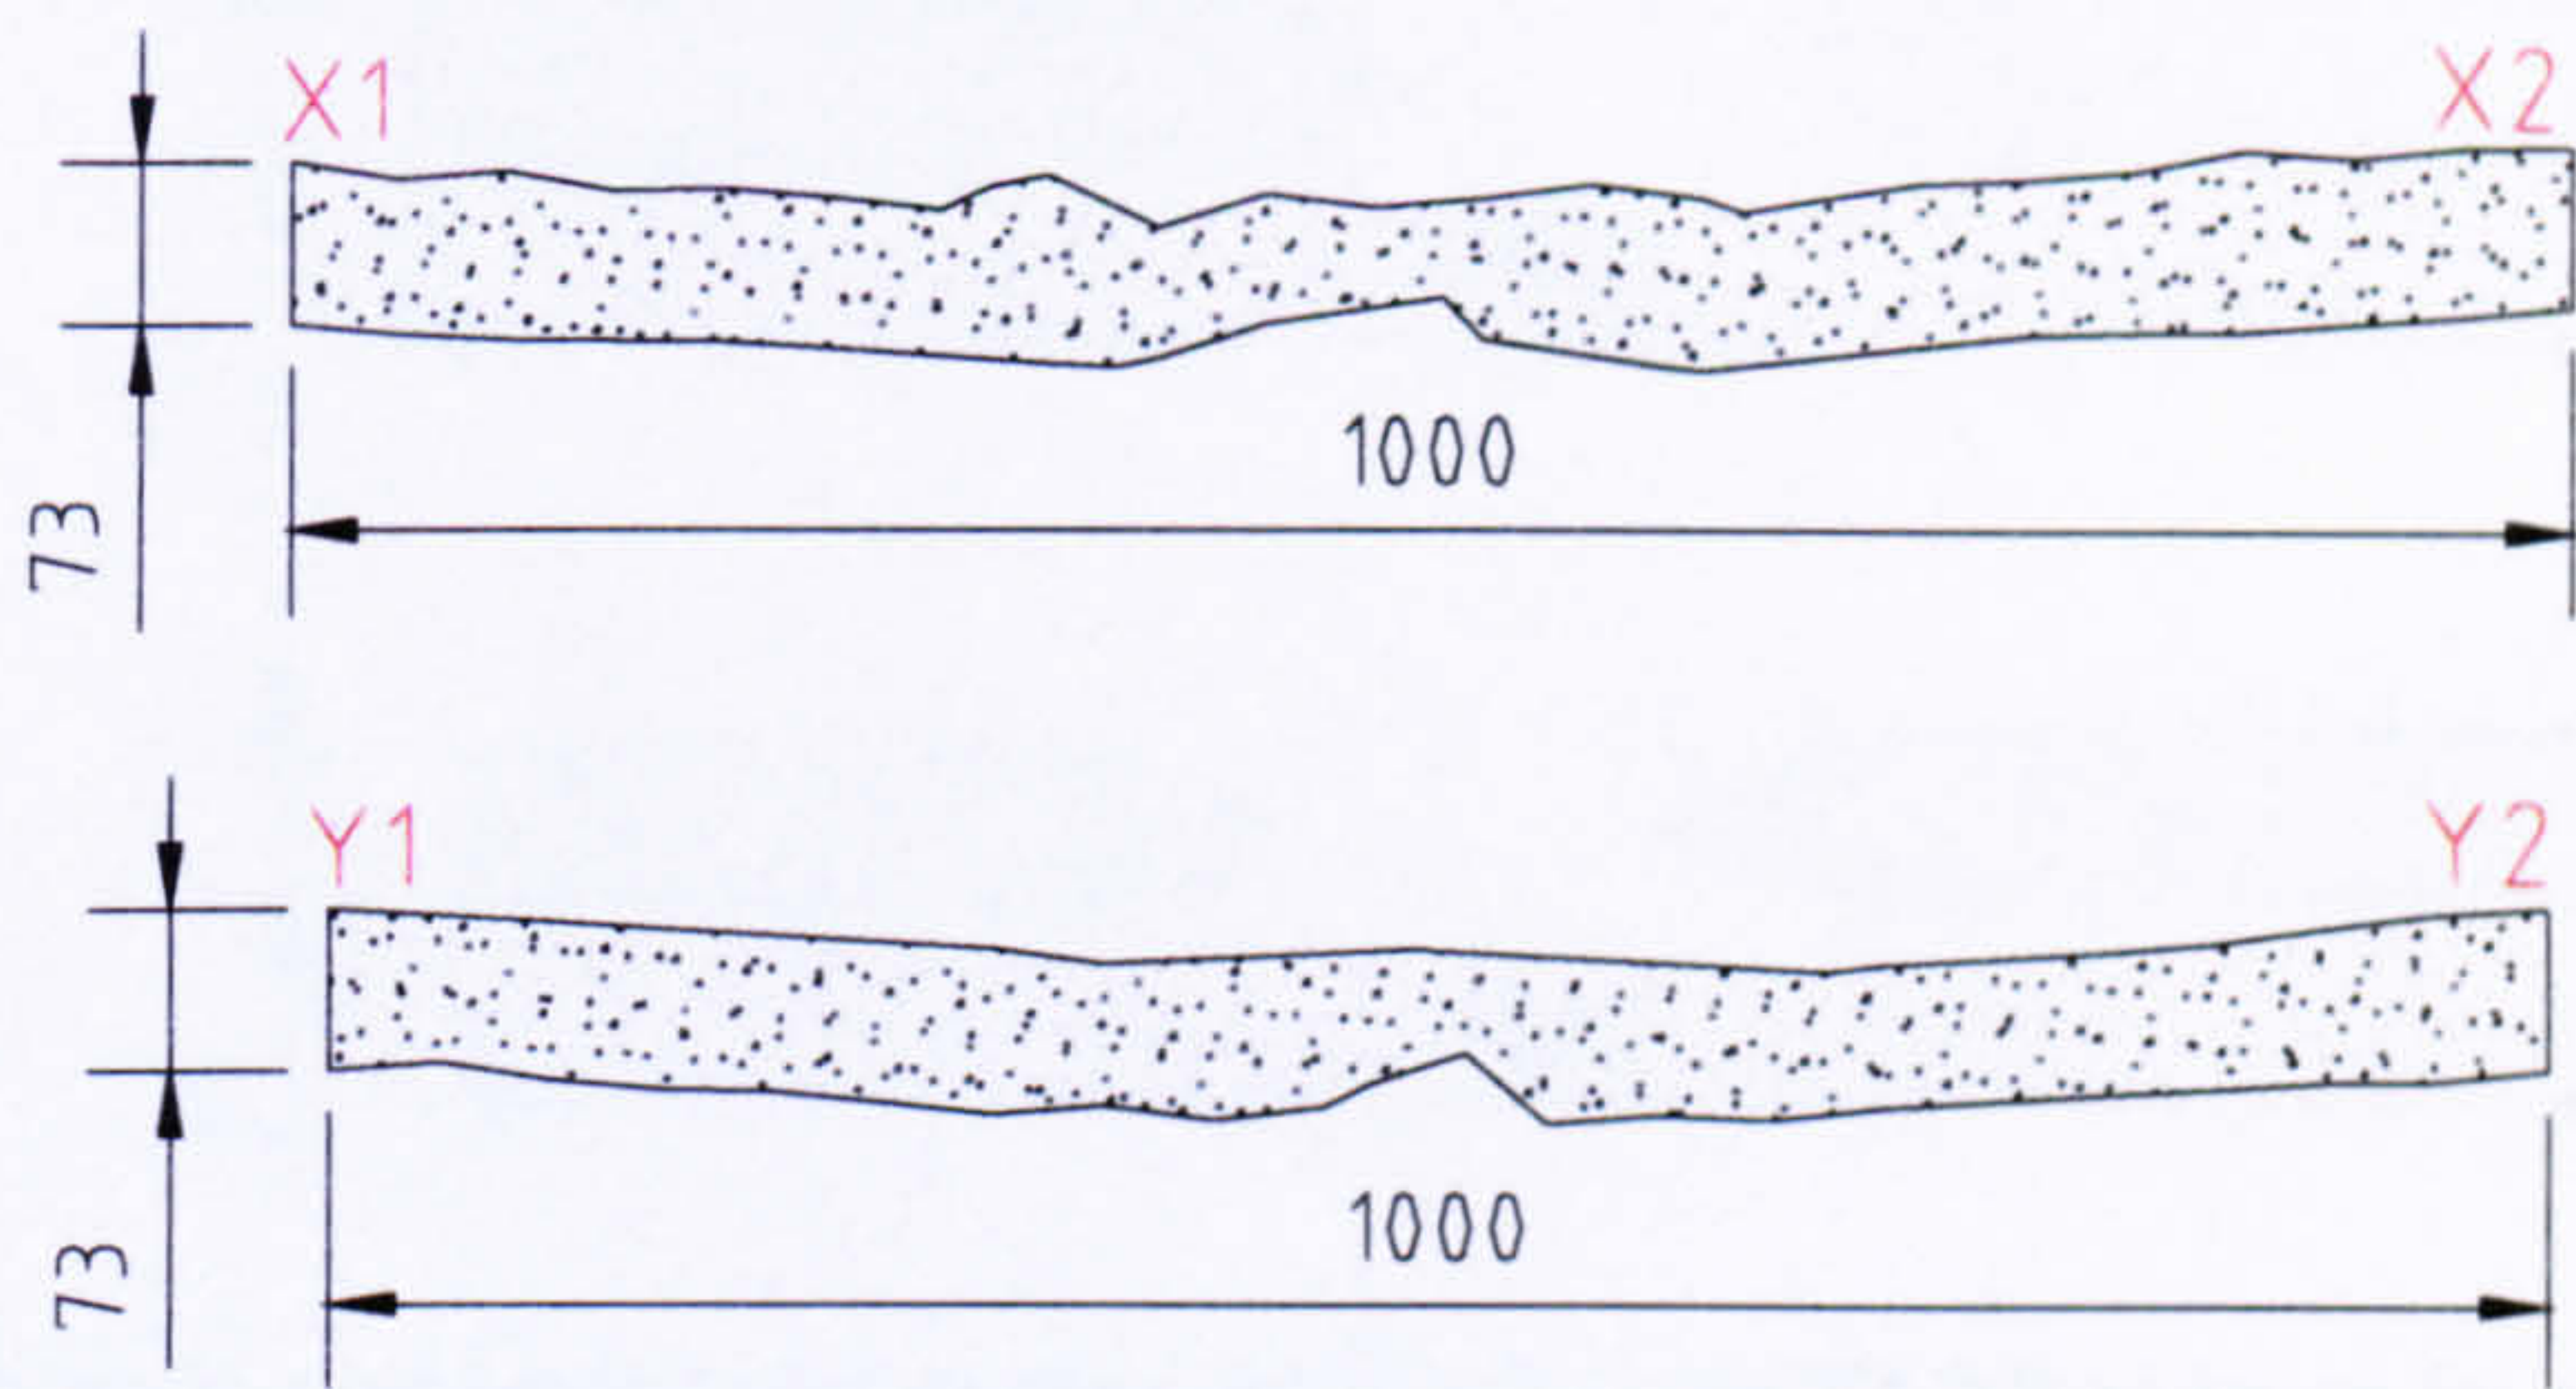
Cross-sectional elevation through X1-X2 and Y1-Y2 of secondary slab RCB73IT1
